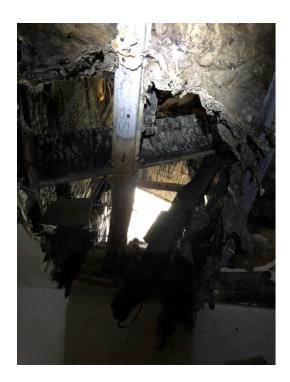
Apartment 1 fire damage to stair above kitchen
